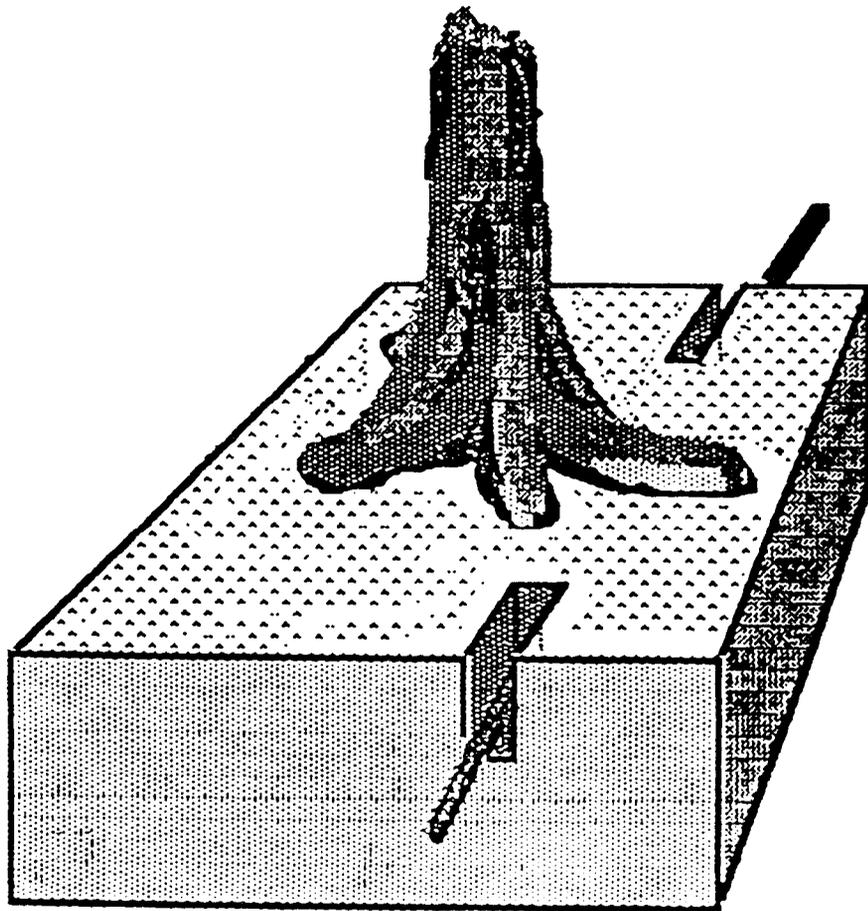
TUNNELING FOR UNDERGROUND UTILITIES
